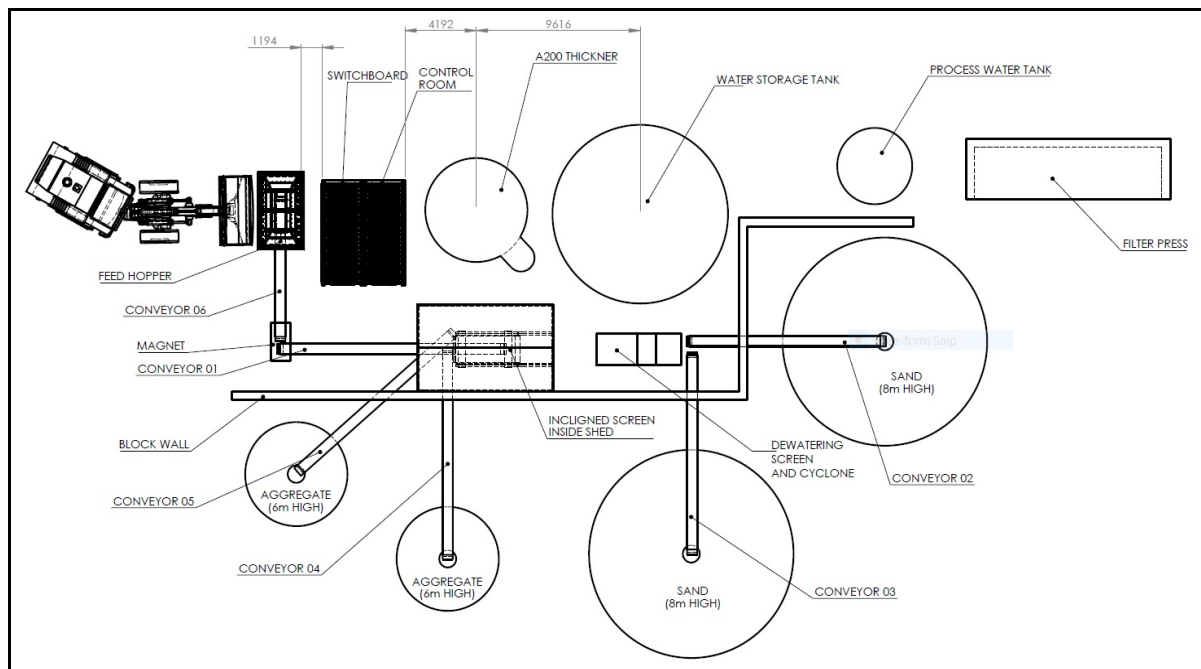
Plan showing the general layout of the proposed sand washing plant.
